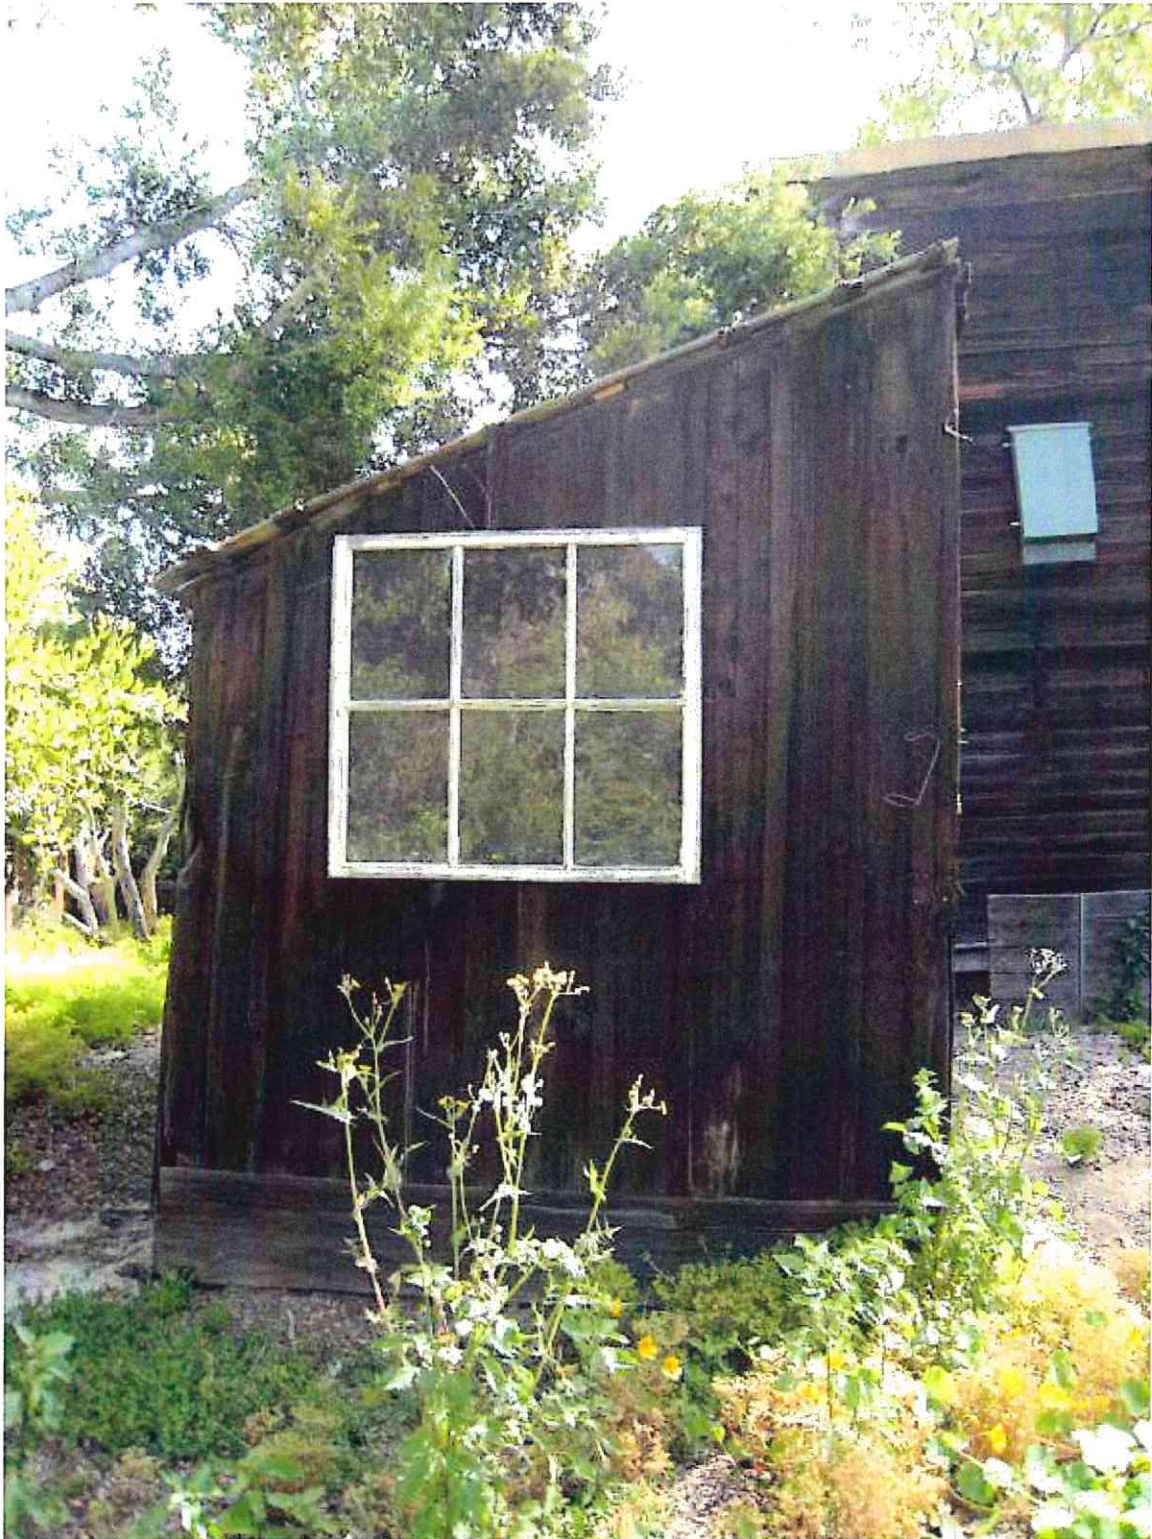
Detail of west elevation of west shed-roof lean-to showing relationship to water tower at rear. Facing east. April 2010. A. C. Cole
